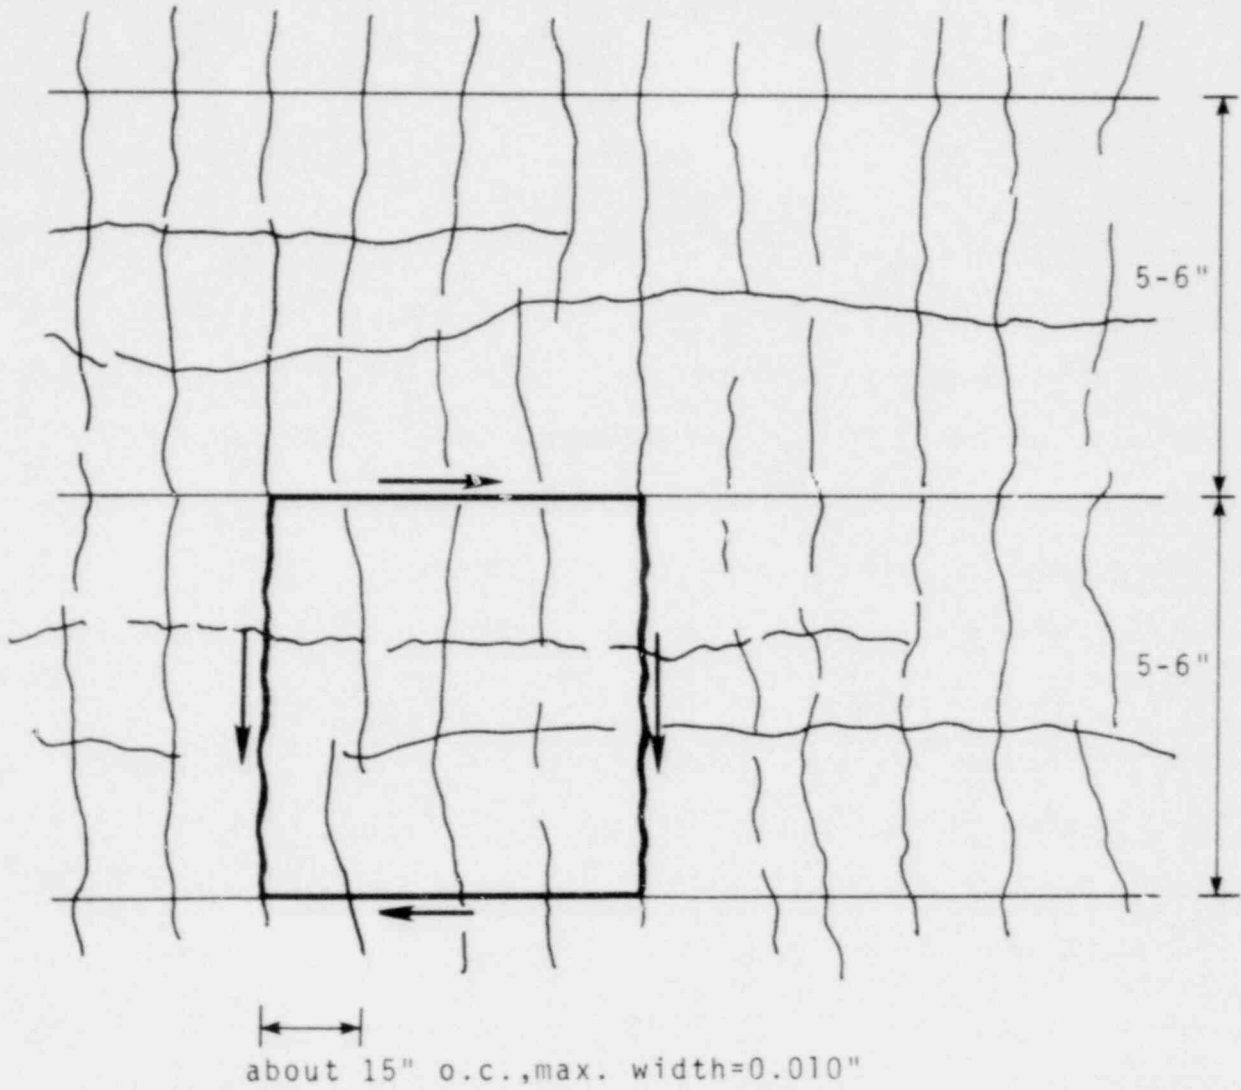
Crack pattern in containment wall (horizontal cracks at each construction joint, plus one or two smaller cracks between joints).
